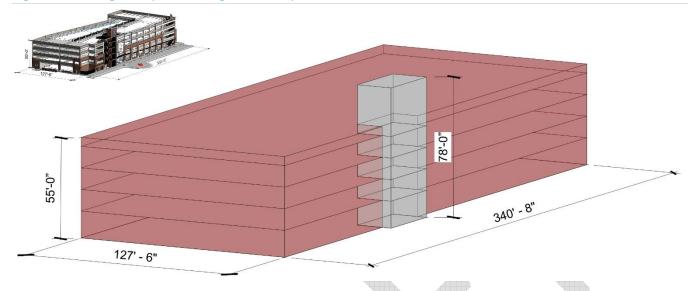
(625 stalls on the ground floor plus four supported levels, 2-bays wide)
